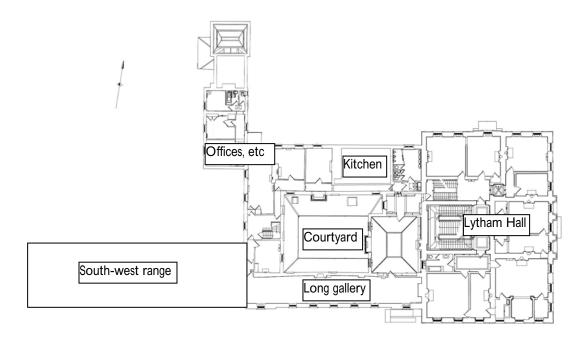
First Floor plan, showing areas mentioned in the text, based on Foster Survey 2007 drawing, with permission Lytham Hall Heritage Trust. NB the South-west range not to scale
